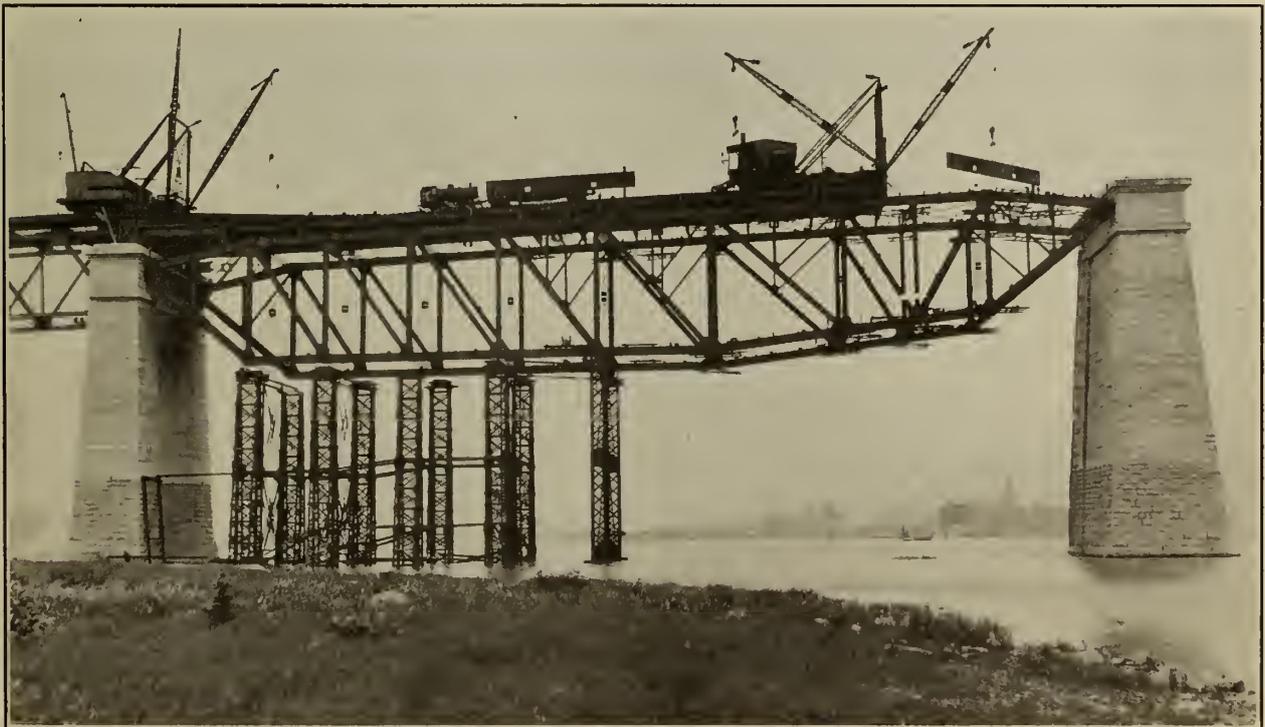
Main Span, South Side—Erecting Falsework Span under Anchor Arm—Third Stage.
